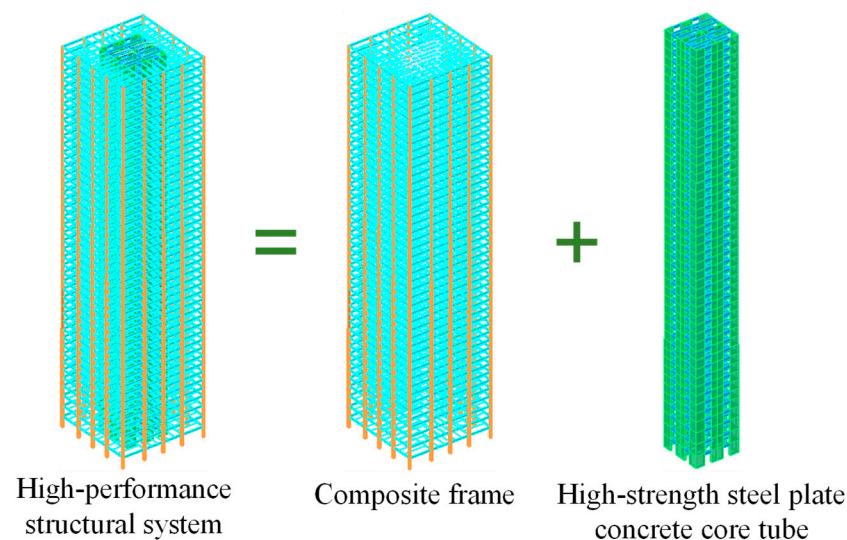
Composite frame—high-strength steel plate wall core tube resilient structural system.
